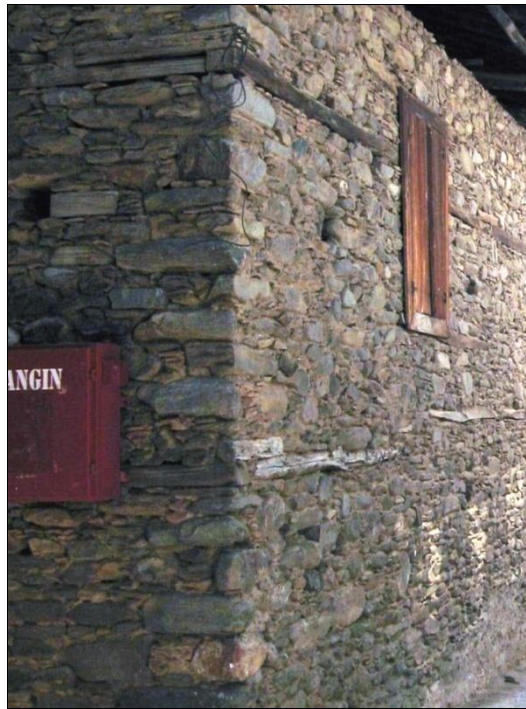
, Corner stones used in masonry walls (Camikebir Quarter Karanfil Street No:14)
